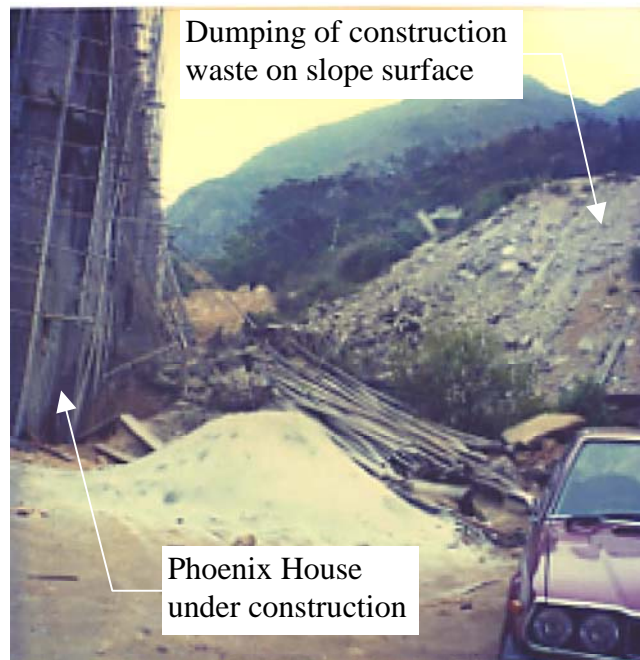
View of the Illegal Dumping of Construction Waste on Slope No. 11NW-B/FR60 in 1982
